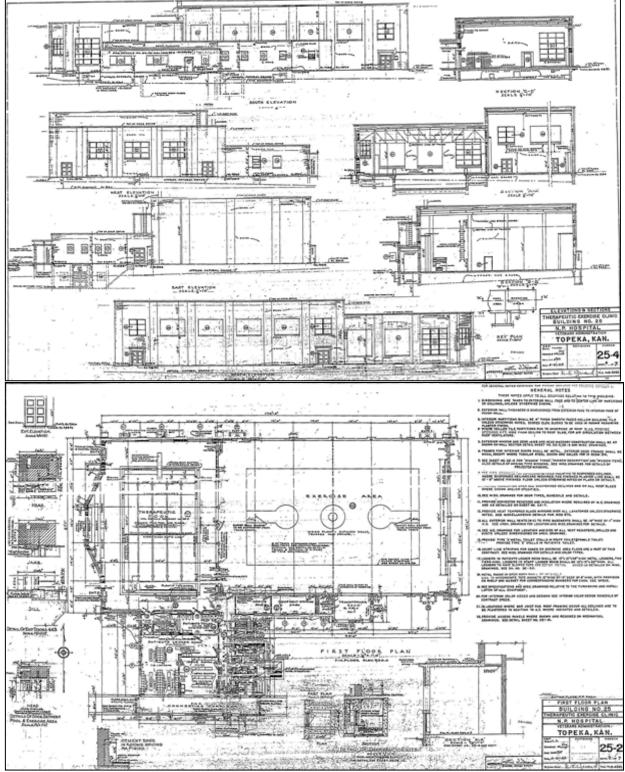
Architectural drawings for Building No. 25 showing elevation and plan, 1955. Note the curvature of the end wall to accommodate the pool (VA).
